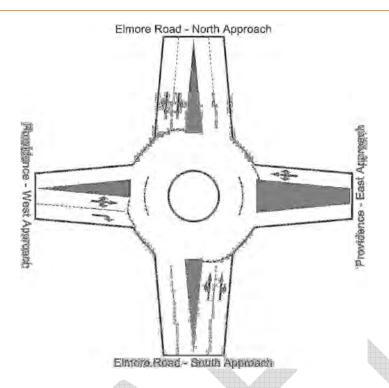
Elmore Road/Providence Drive Intersection Conceptual Roundabout – with Northern Access to UMED
